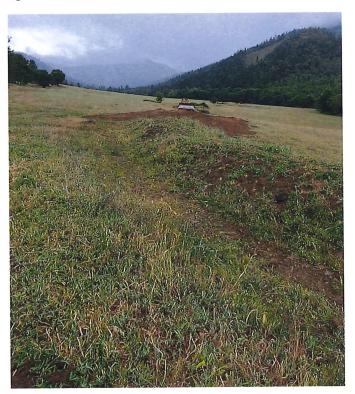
Existing earth irrigation conveyance ditch near beginning of water right place of use, looking South towards POD. Photo shows it being removed in early 2020 in preparation for pipeline installation and sprinkler irrigation.
